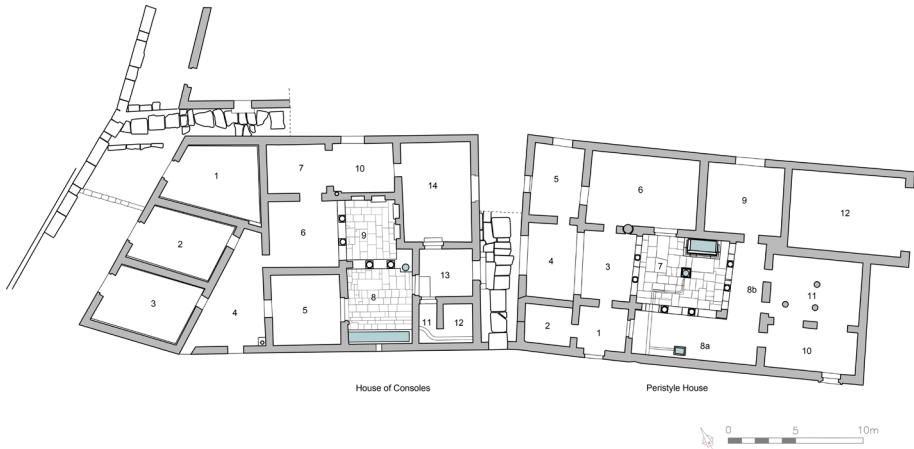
The Peristyle House and House of Consoles in Side – Plan and the Location of the Fountains (processed from Mansel 1978, Fig. 262)
